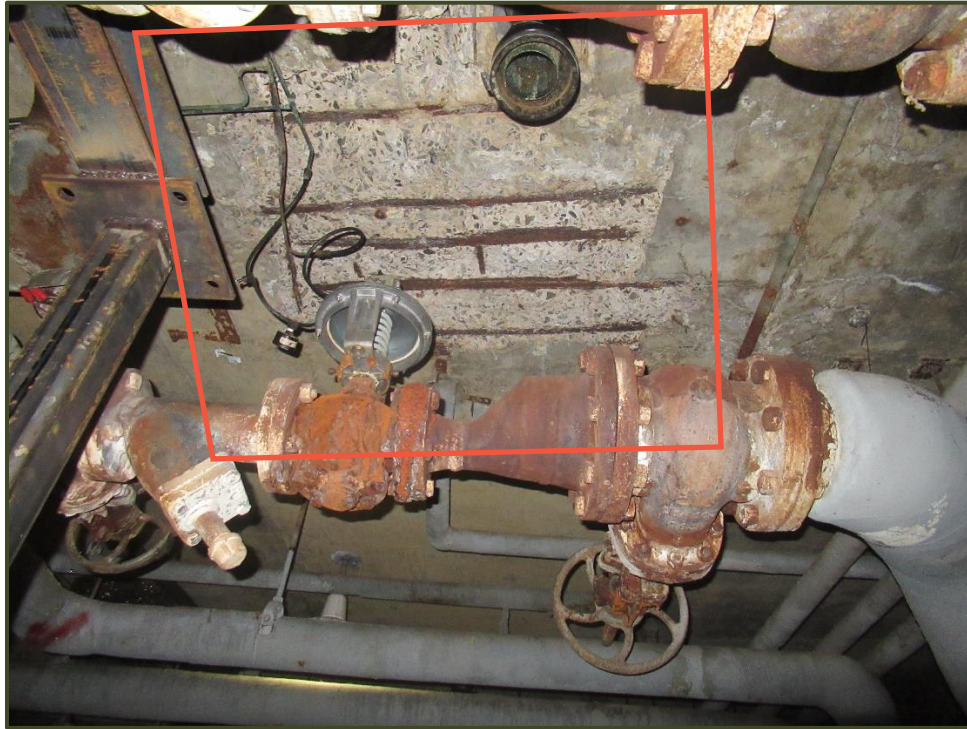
Concrete spalling & cracking below baking room
